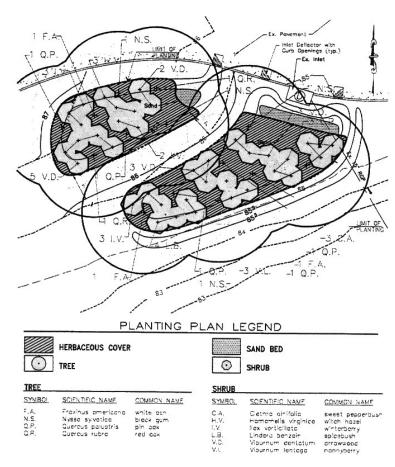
Sample Bioretention Area Planting Plan (Source: VDCR. 1999)
